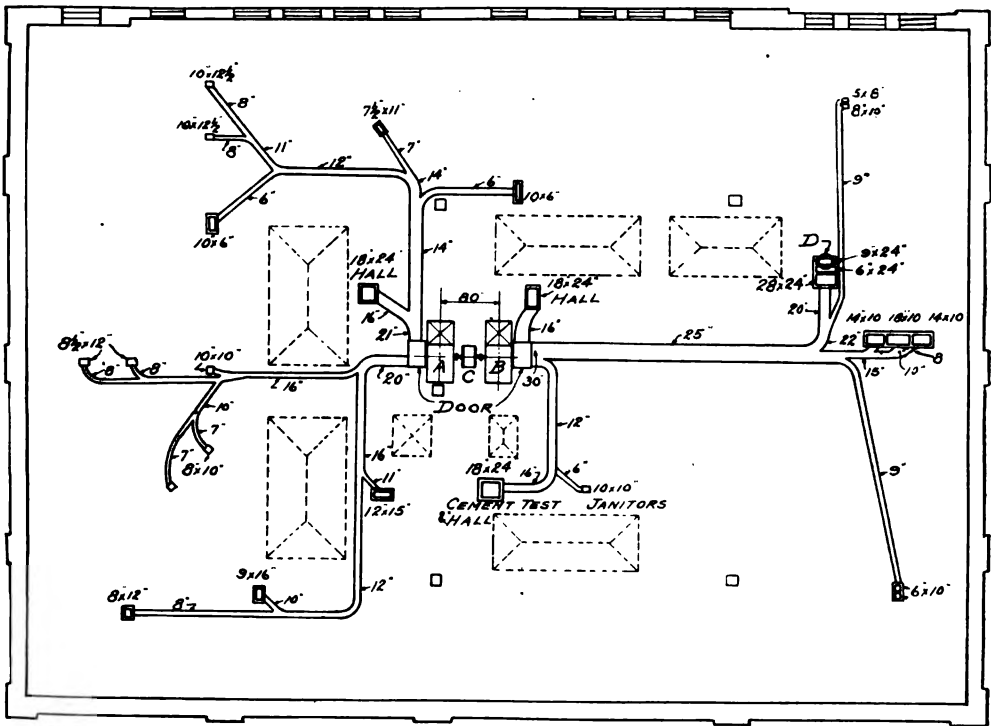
SOME OF THE DUCT WORK IN PLANT OF HYDRAULIC POWER CO.
